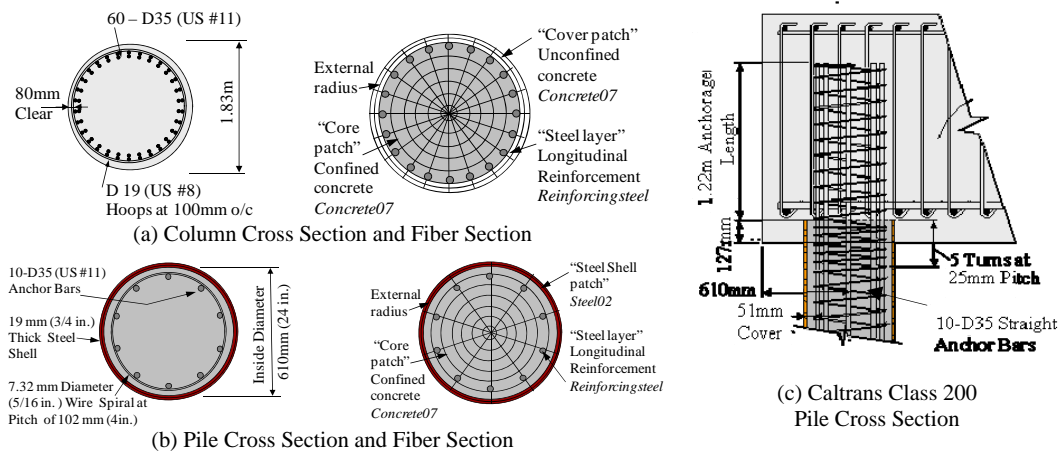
Modelling of Prototype Column and Pile Cross Sections
